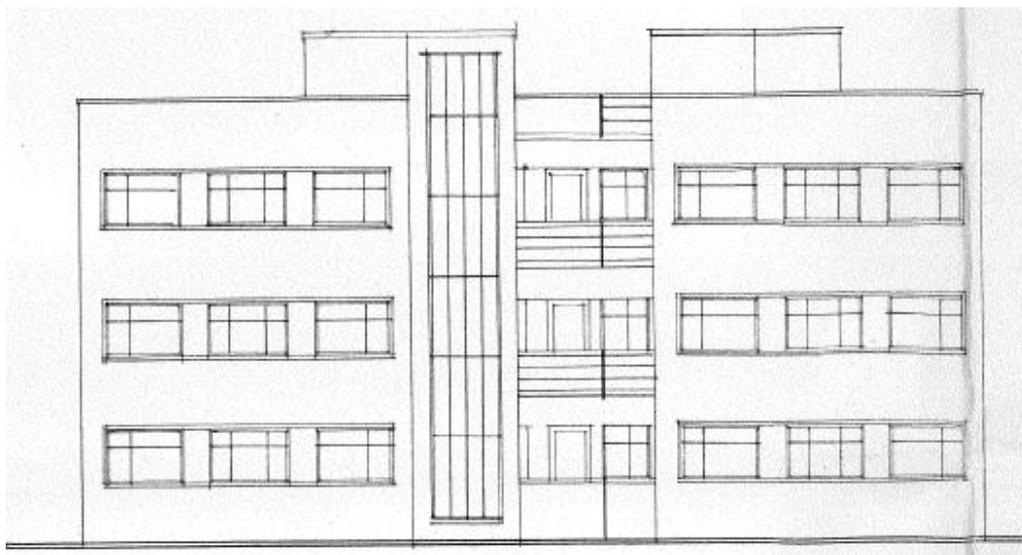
Front elevation, from plans related to Building Permit U1174 (M Benshemesh, 1951) (Source: Council Building File)
